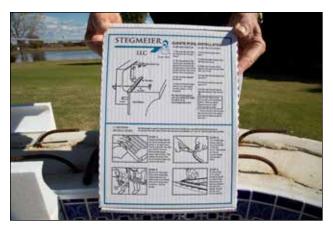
Instructions for installing the Stegmeier pool coping forms with tile track.
